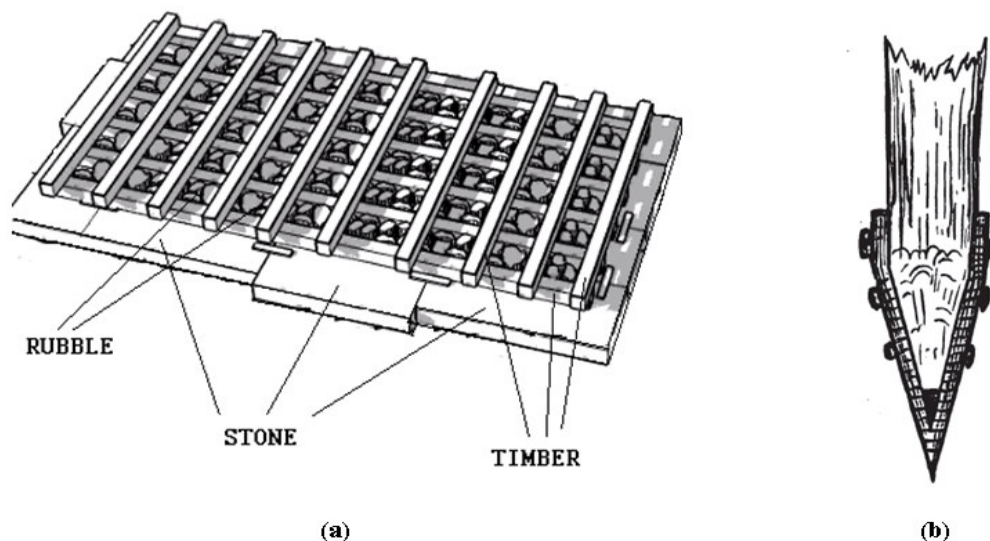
The timber raft foundation for masonry bridges (a) and the timber pile elevation drawing (b)
